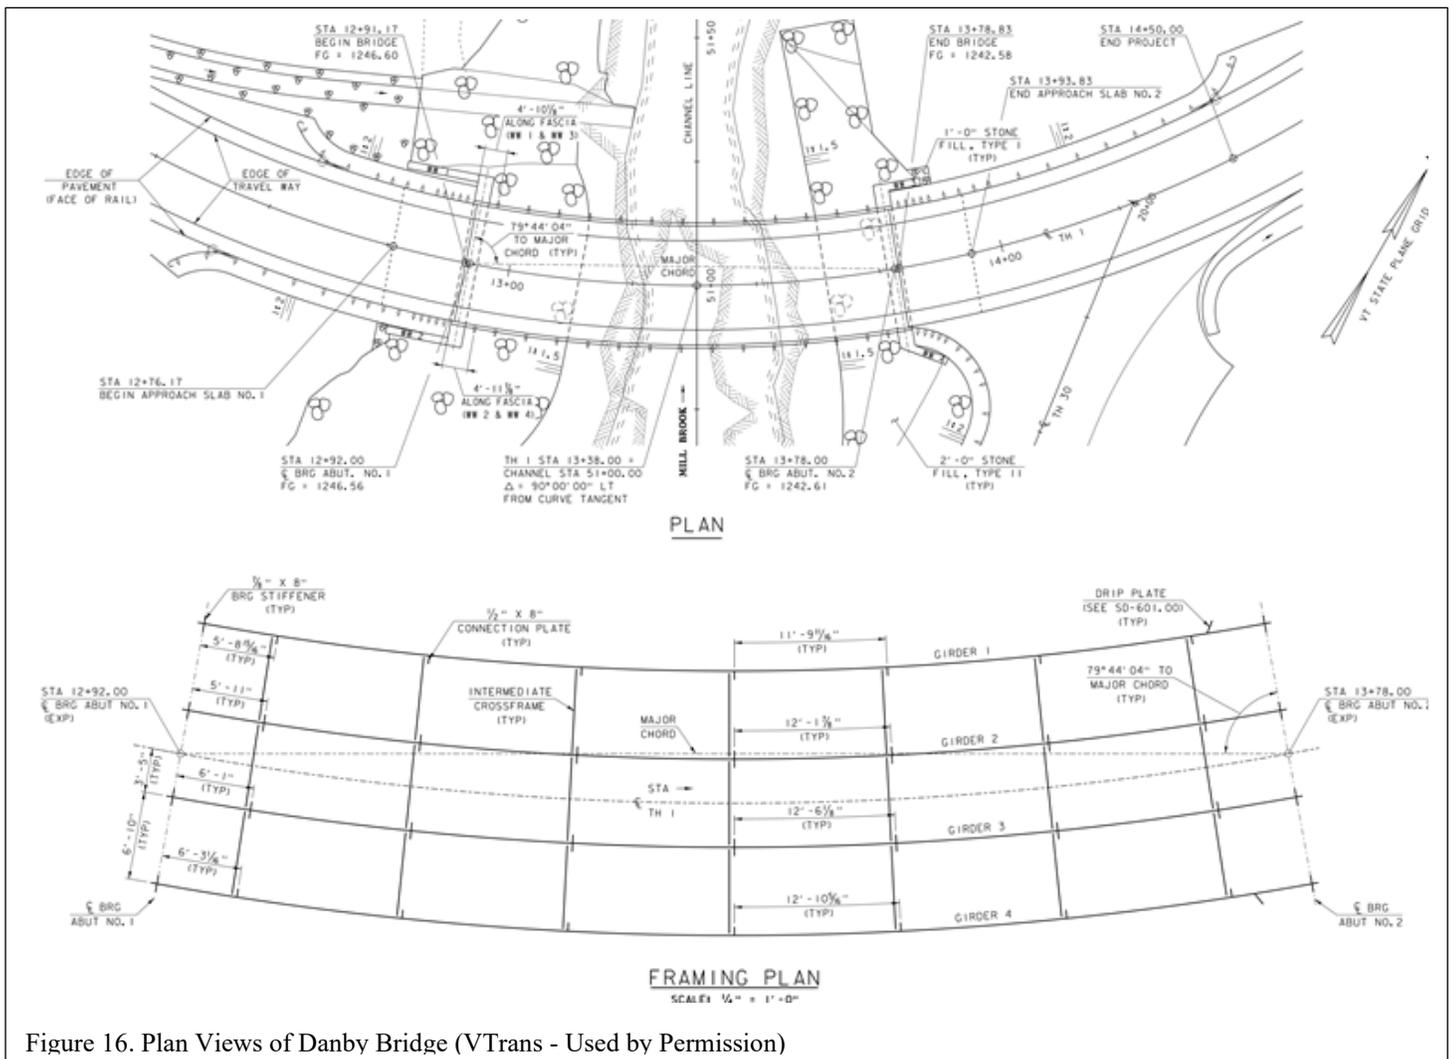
Plan Views of Danby Bridge (VTrans - Used by Permission)
